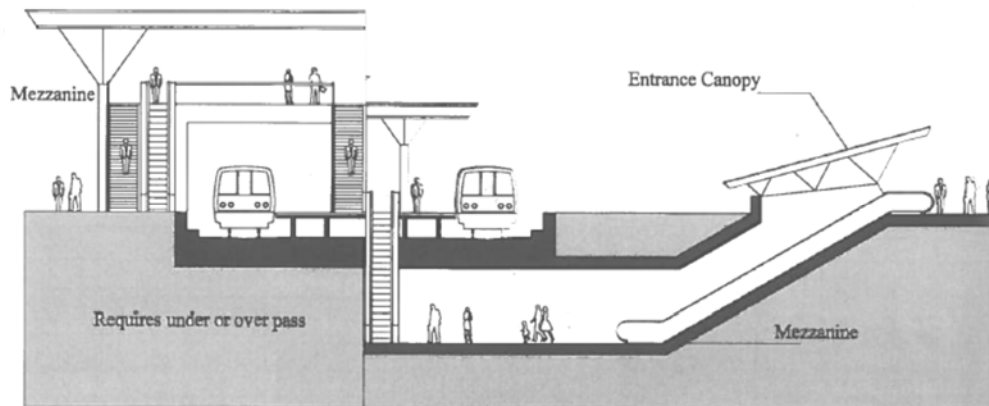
Schematic section of an at-grade station type showing the platform with alternative under and overpass alternatives to the platform (Griffin, 2004).
